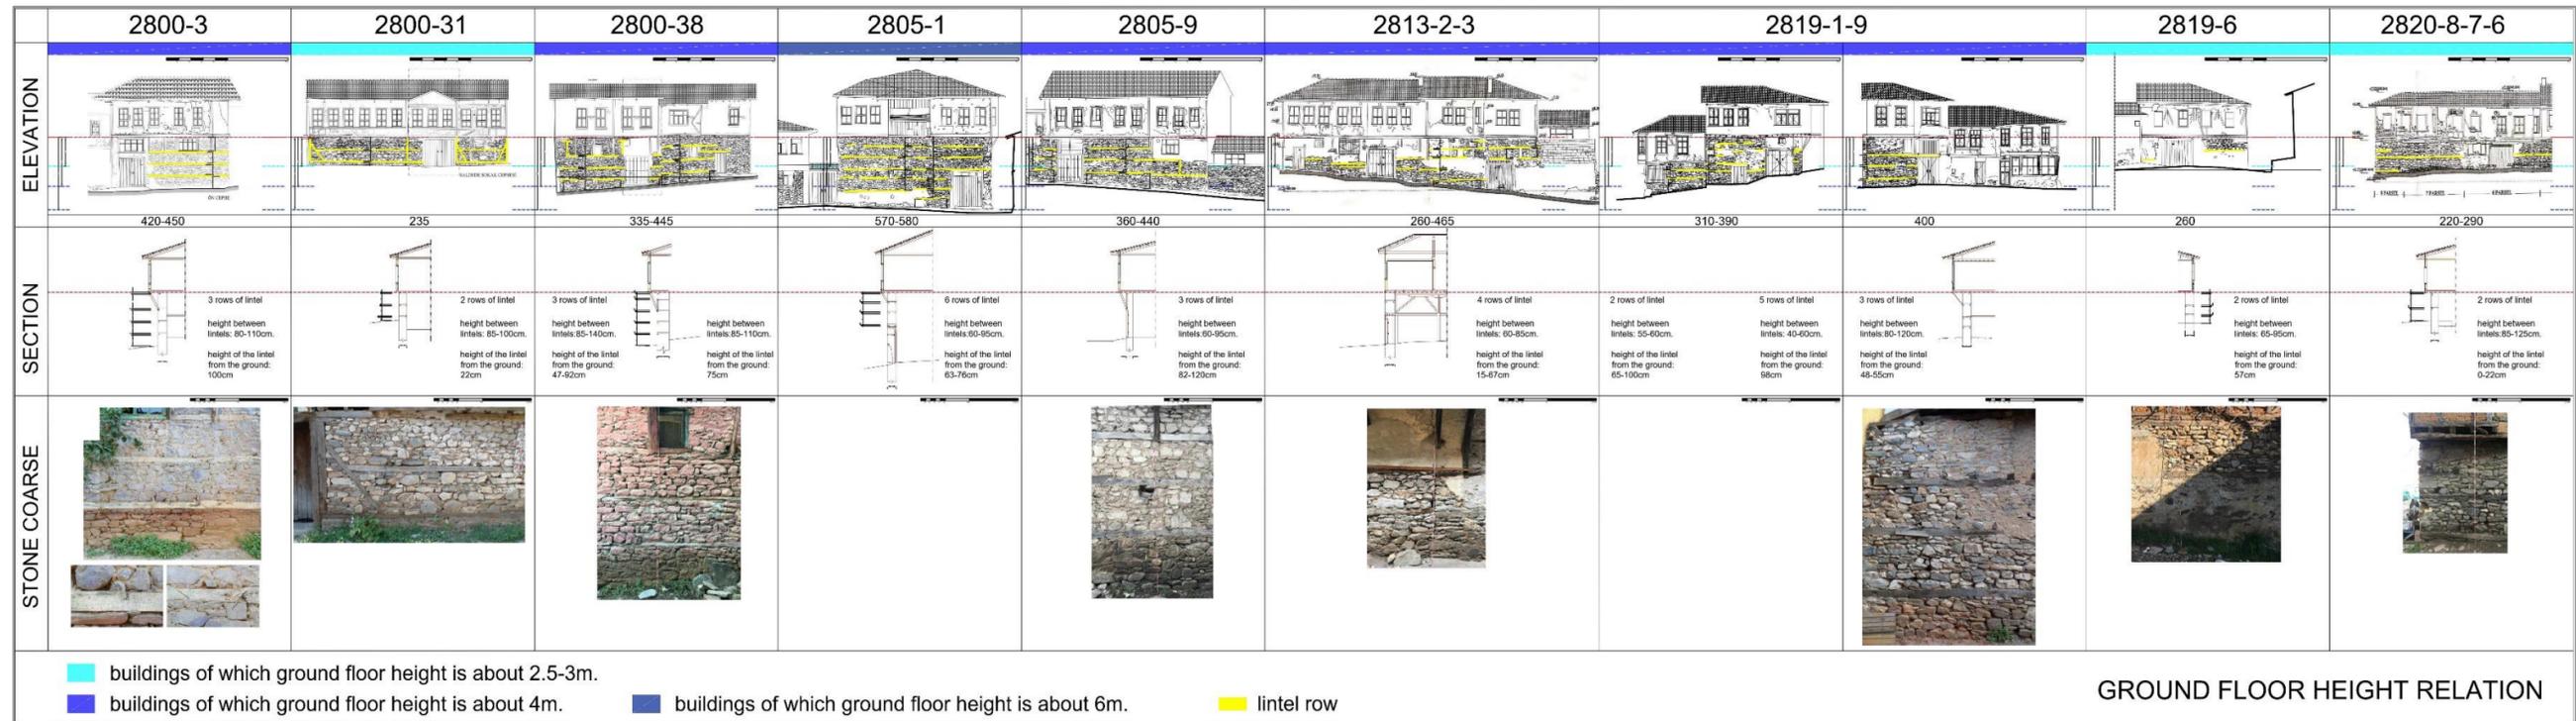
Ground floor and 1st floor height relation, timber lintels in stone walls and stone courses
